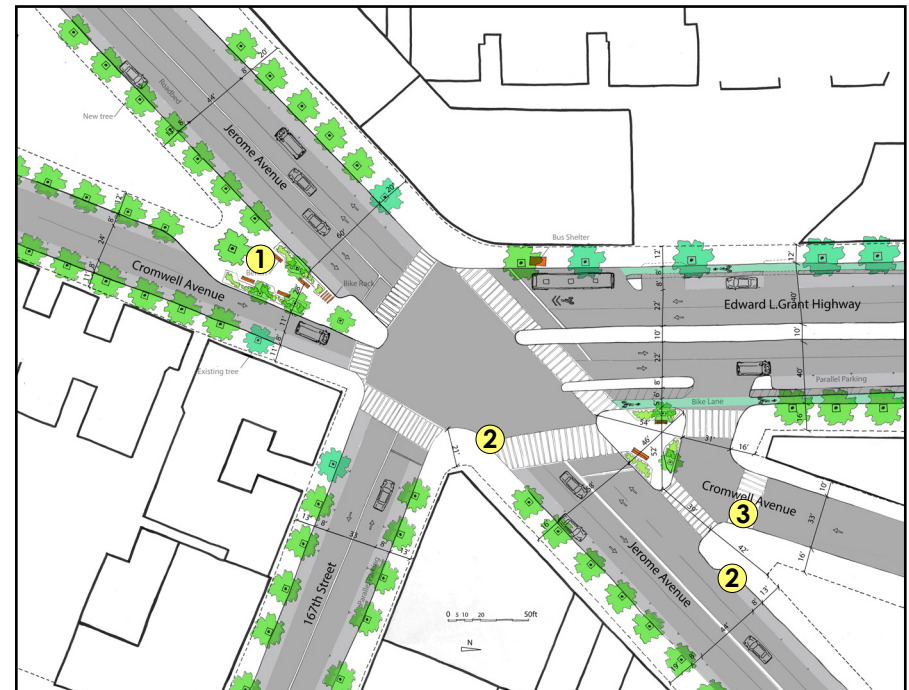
167th Street and Jerome Avenue proposal 1
